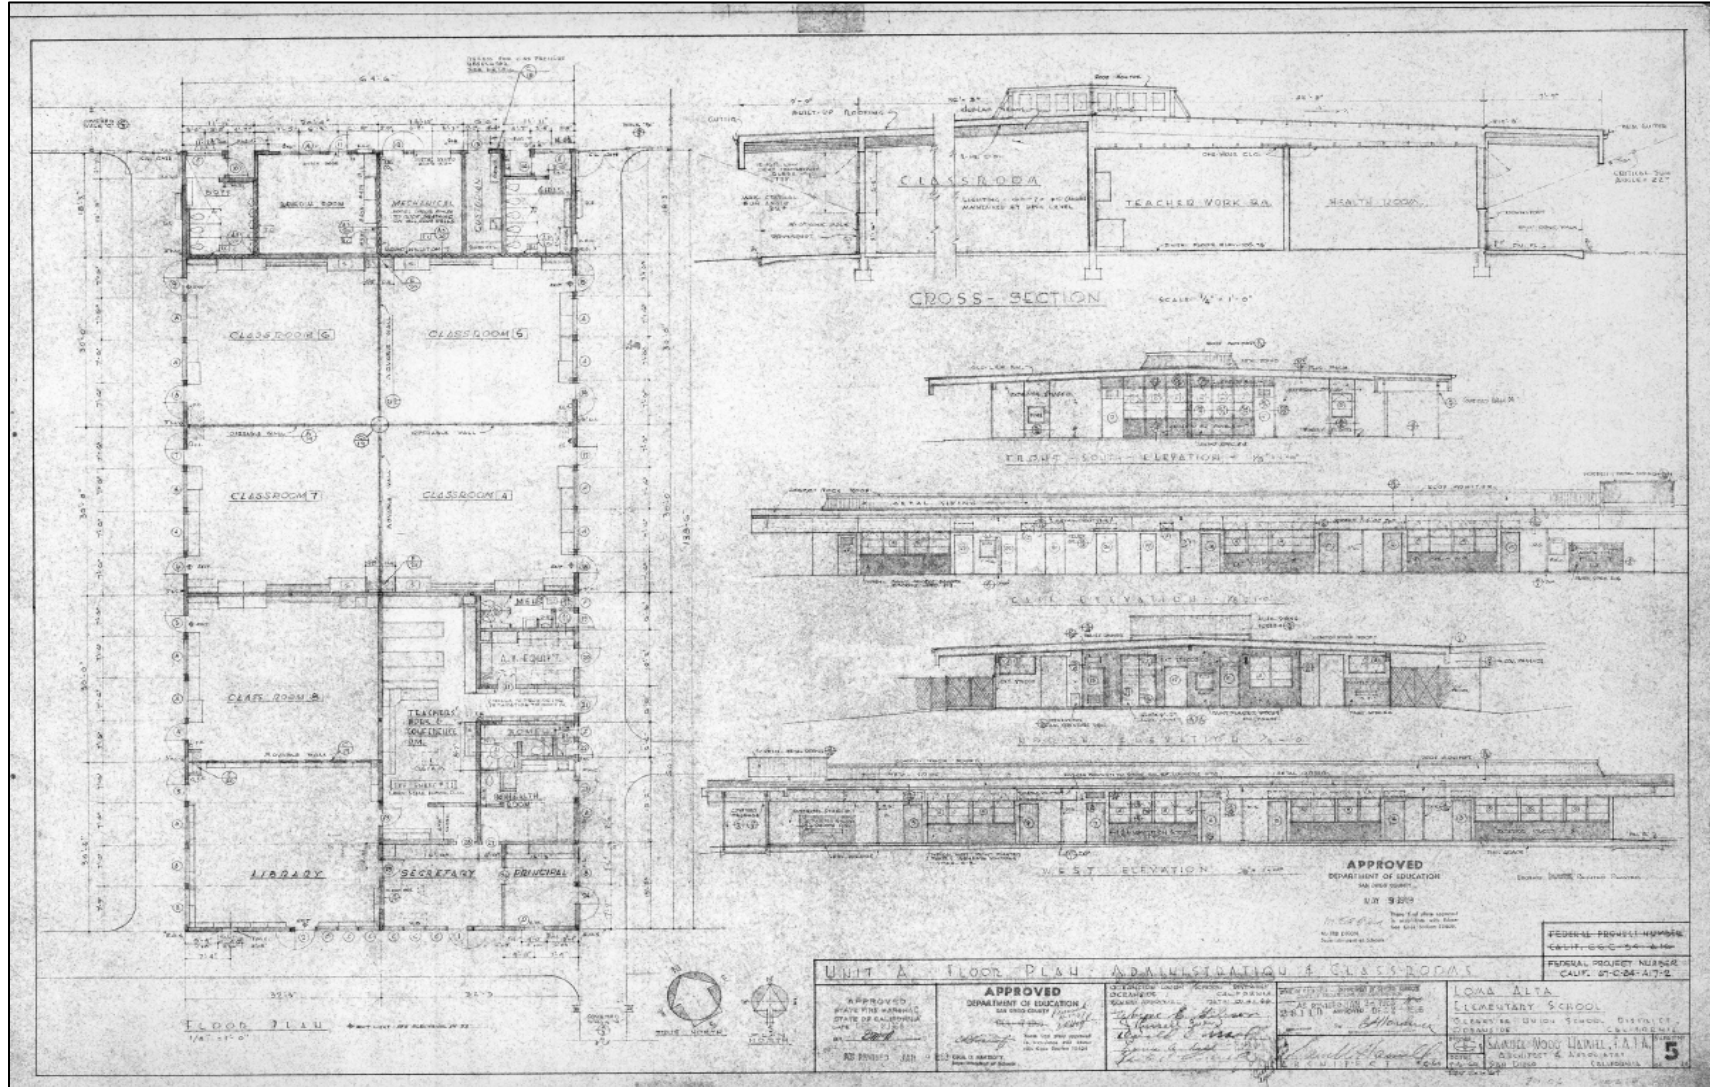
1966 Unit A Floor Plan and Elevation Drawing, Sheet 5. Source: San Diego History Center.
